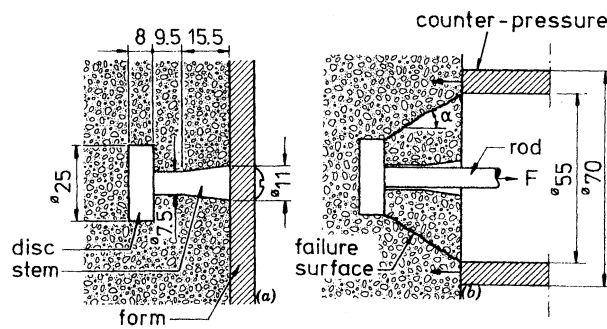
Application and configuration of Lok-Test (all dimensions are in millimeters)
